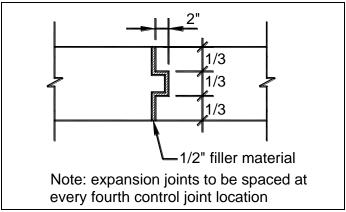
TYPICAL EXPANSION JOINT DETAIL
